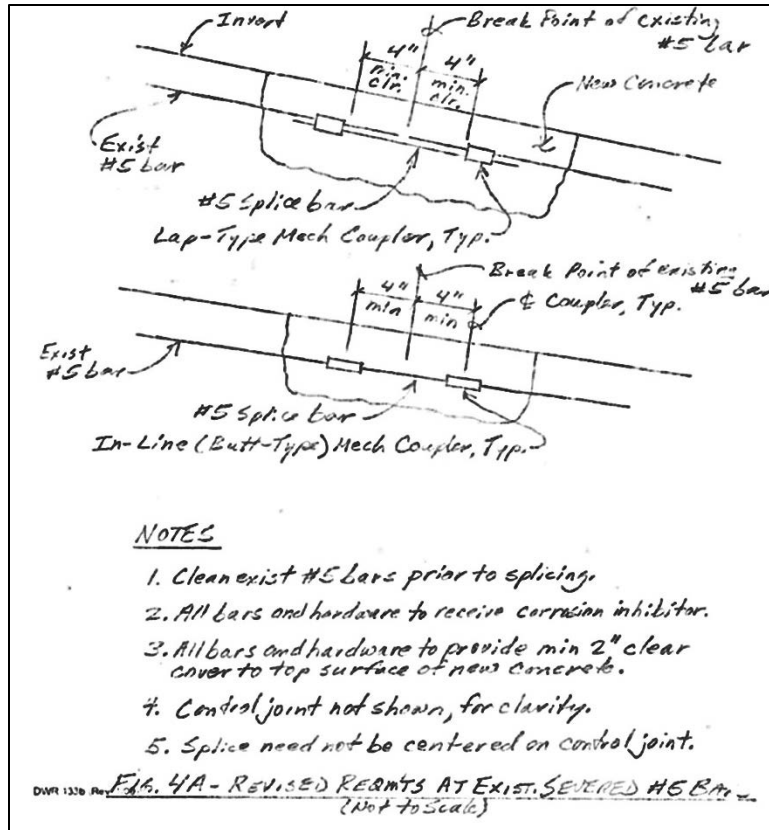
Revision to 2009 Repairs to Splice Broken Rebar Over Drains
